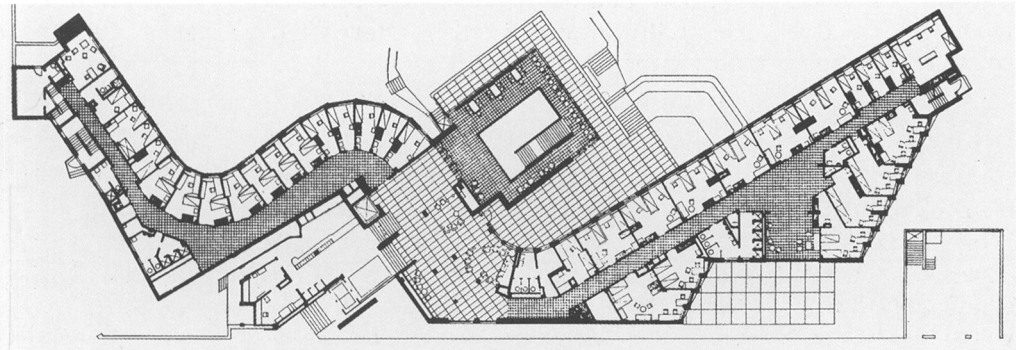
Alvar Aalto, *Baker House Dormitory, MIT, Cambridge, MA, 1946–49. Plan (Alvar Aalto Foundation)
